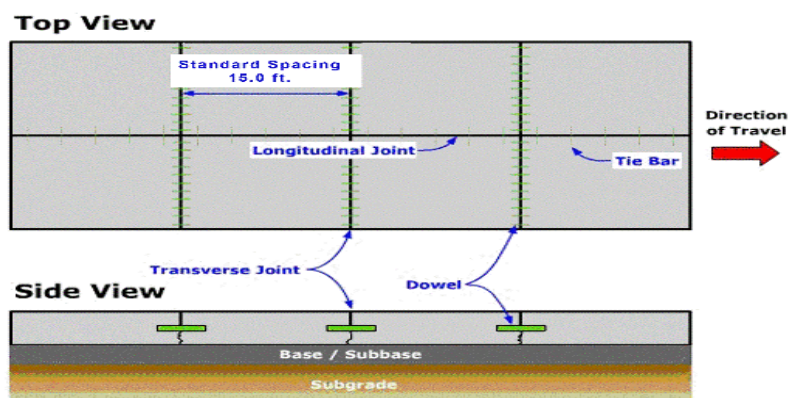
Concrete Pavement Contraction Design (CPCD)
